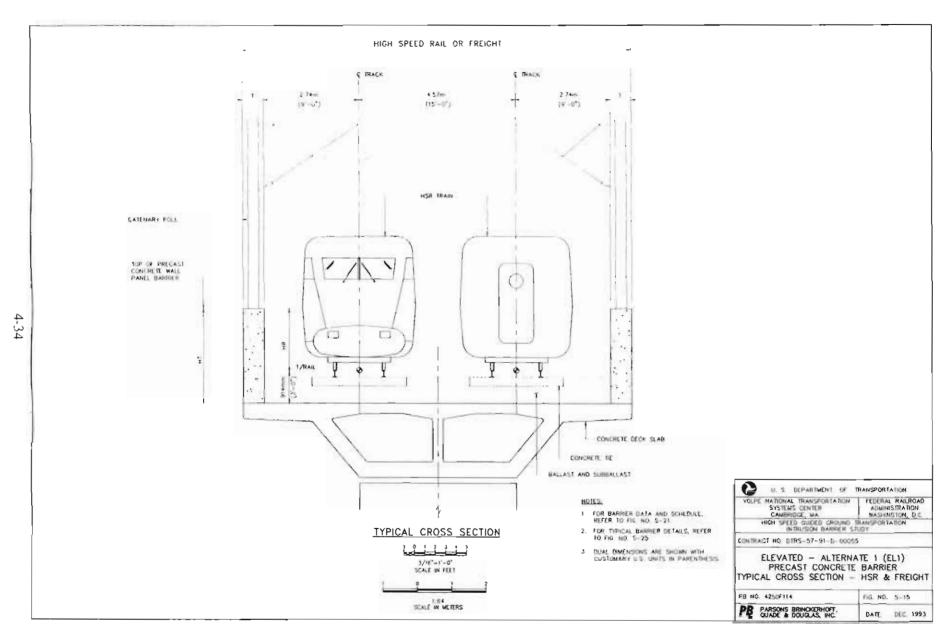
ELEVATED ALTERNATE 1: PRECAST CONCRETE WALL - TRANSVERSE SECTION/RR
